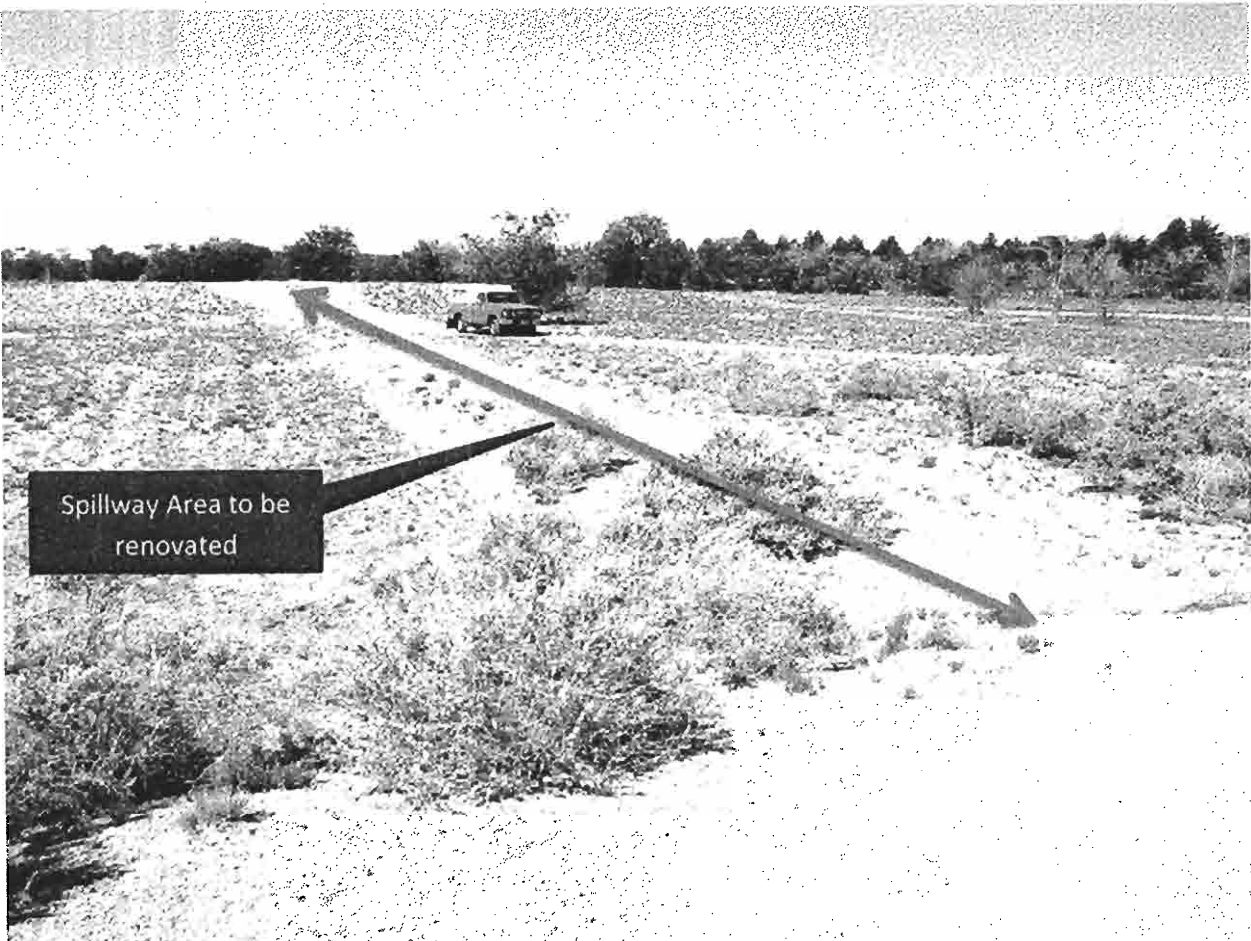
Existing Emergency Spillway Area, looking southwest from northeast end of spillway.
